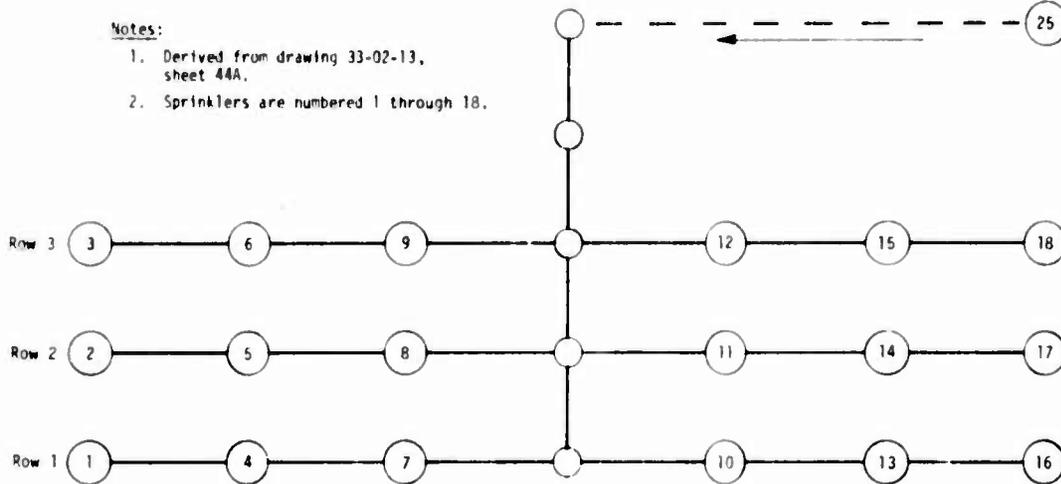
Small Sprinkler System in Buildings 350, 368, and 660 at Robins Air Force Base
